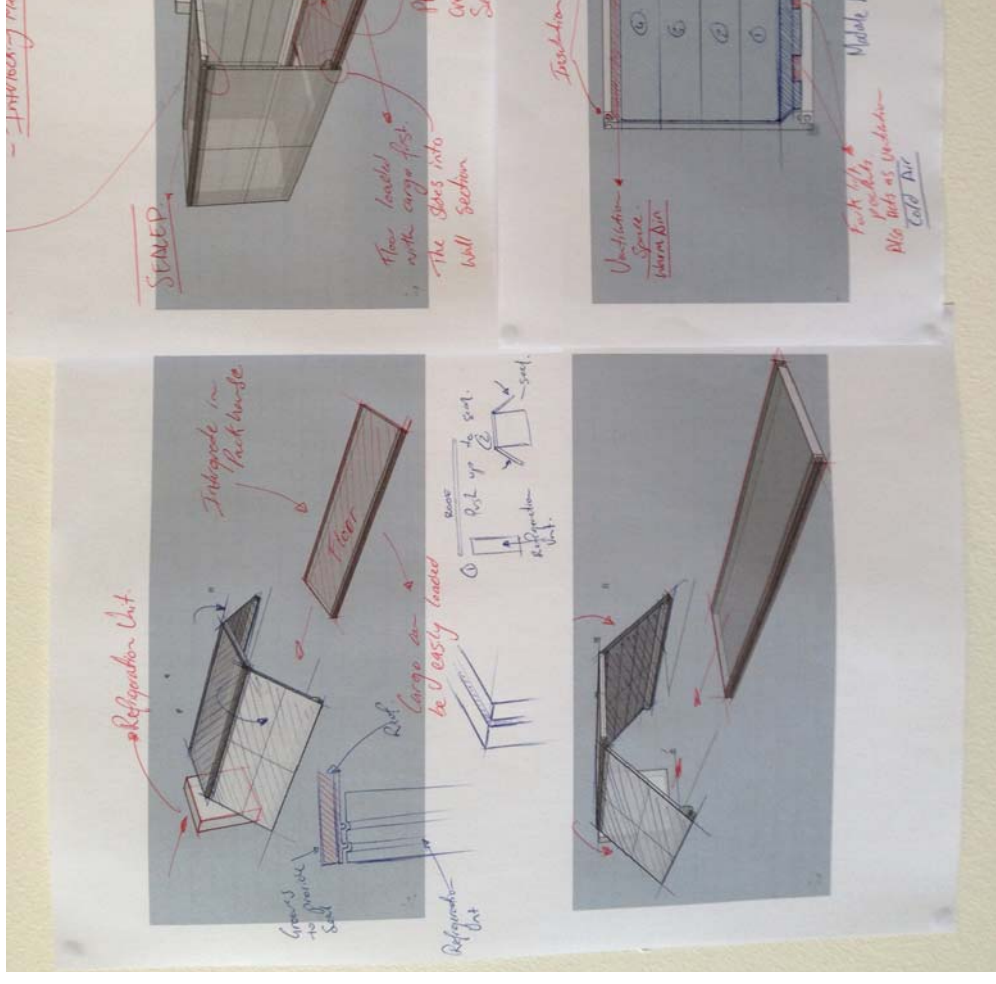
Initial components were drawn in CAD to apply real, physical dimensions. Alternating modes prompted various explorations of configuration
